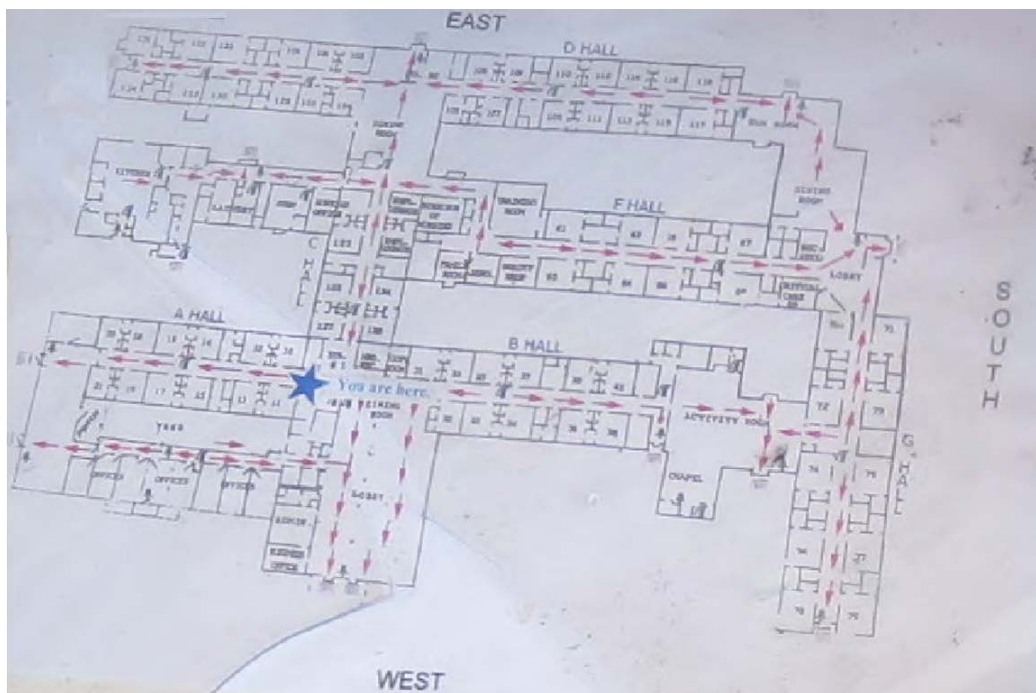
Emergency Exit Floor Plan for the West Rest Haven (Source: CSB)
